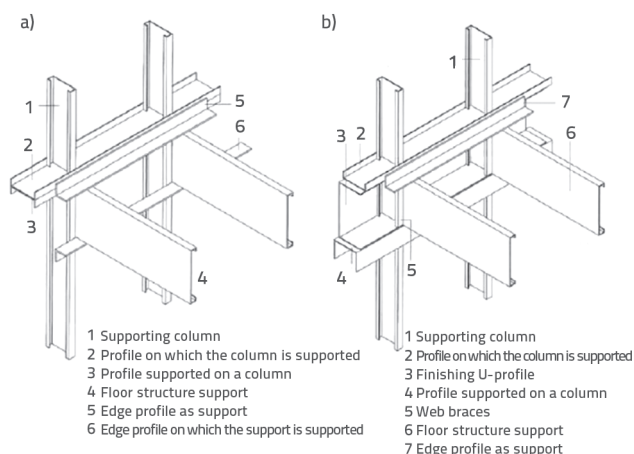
Variants of lightweight panel construction system [6]: a) Continuous walls, b) Inserted walls
